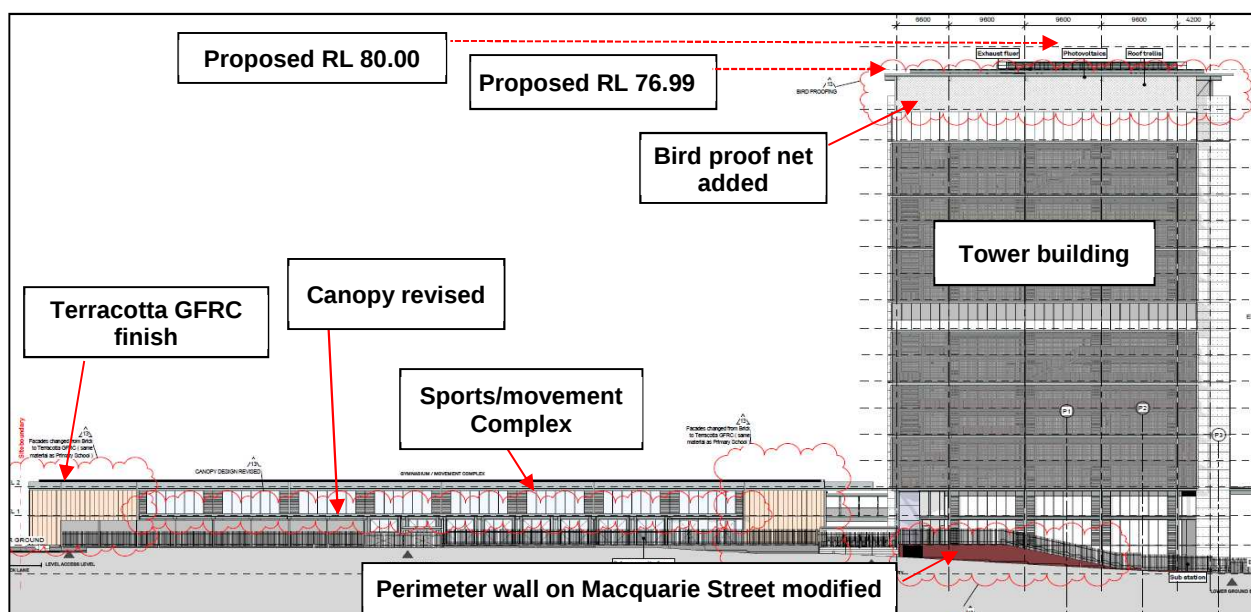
Proposed south elevation APHS site (Source: Applicant's Mod 3 EIS)
